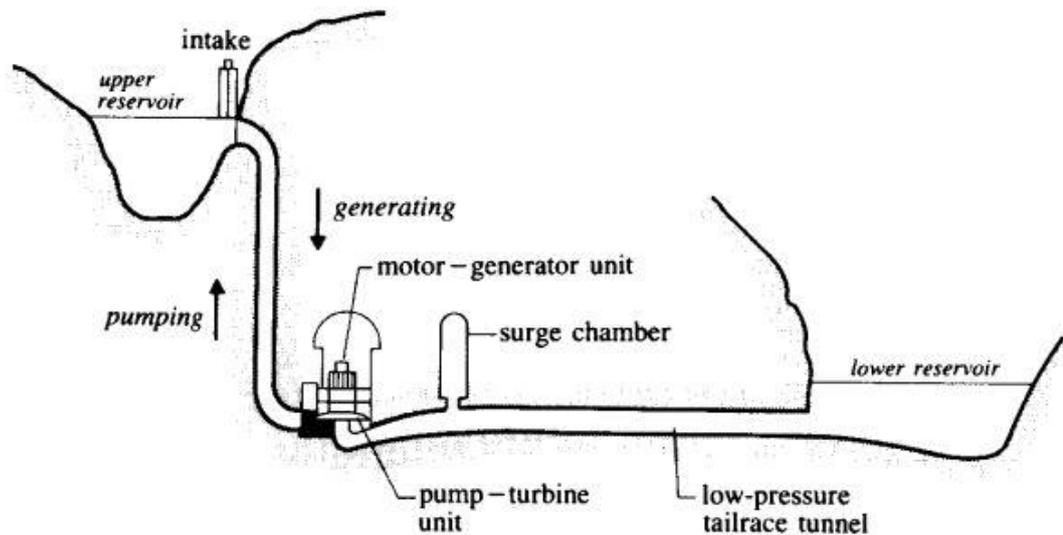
Typical Layout of a Pump Storage Plant (P. Novak et al, 2004)
